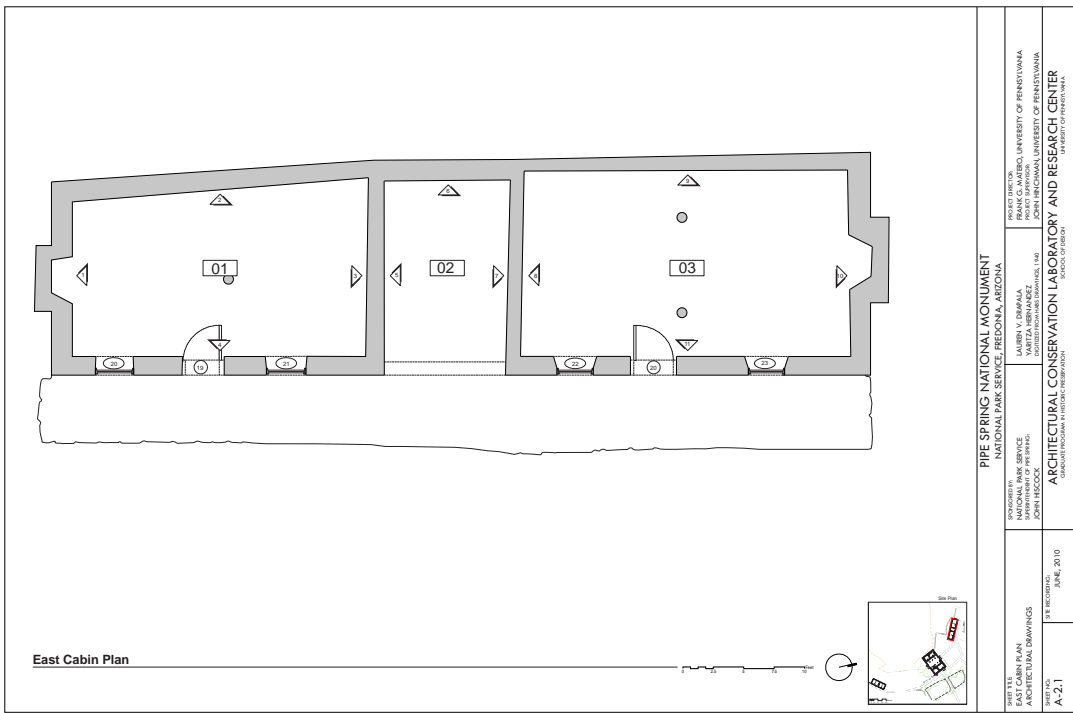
The Architectural Conservation Laboratory, “East cabin plan drawing” (June 2010).
